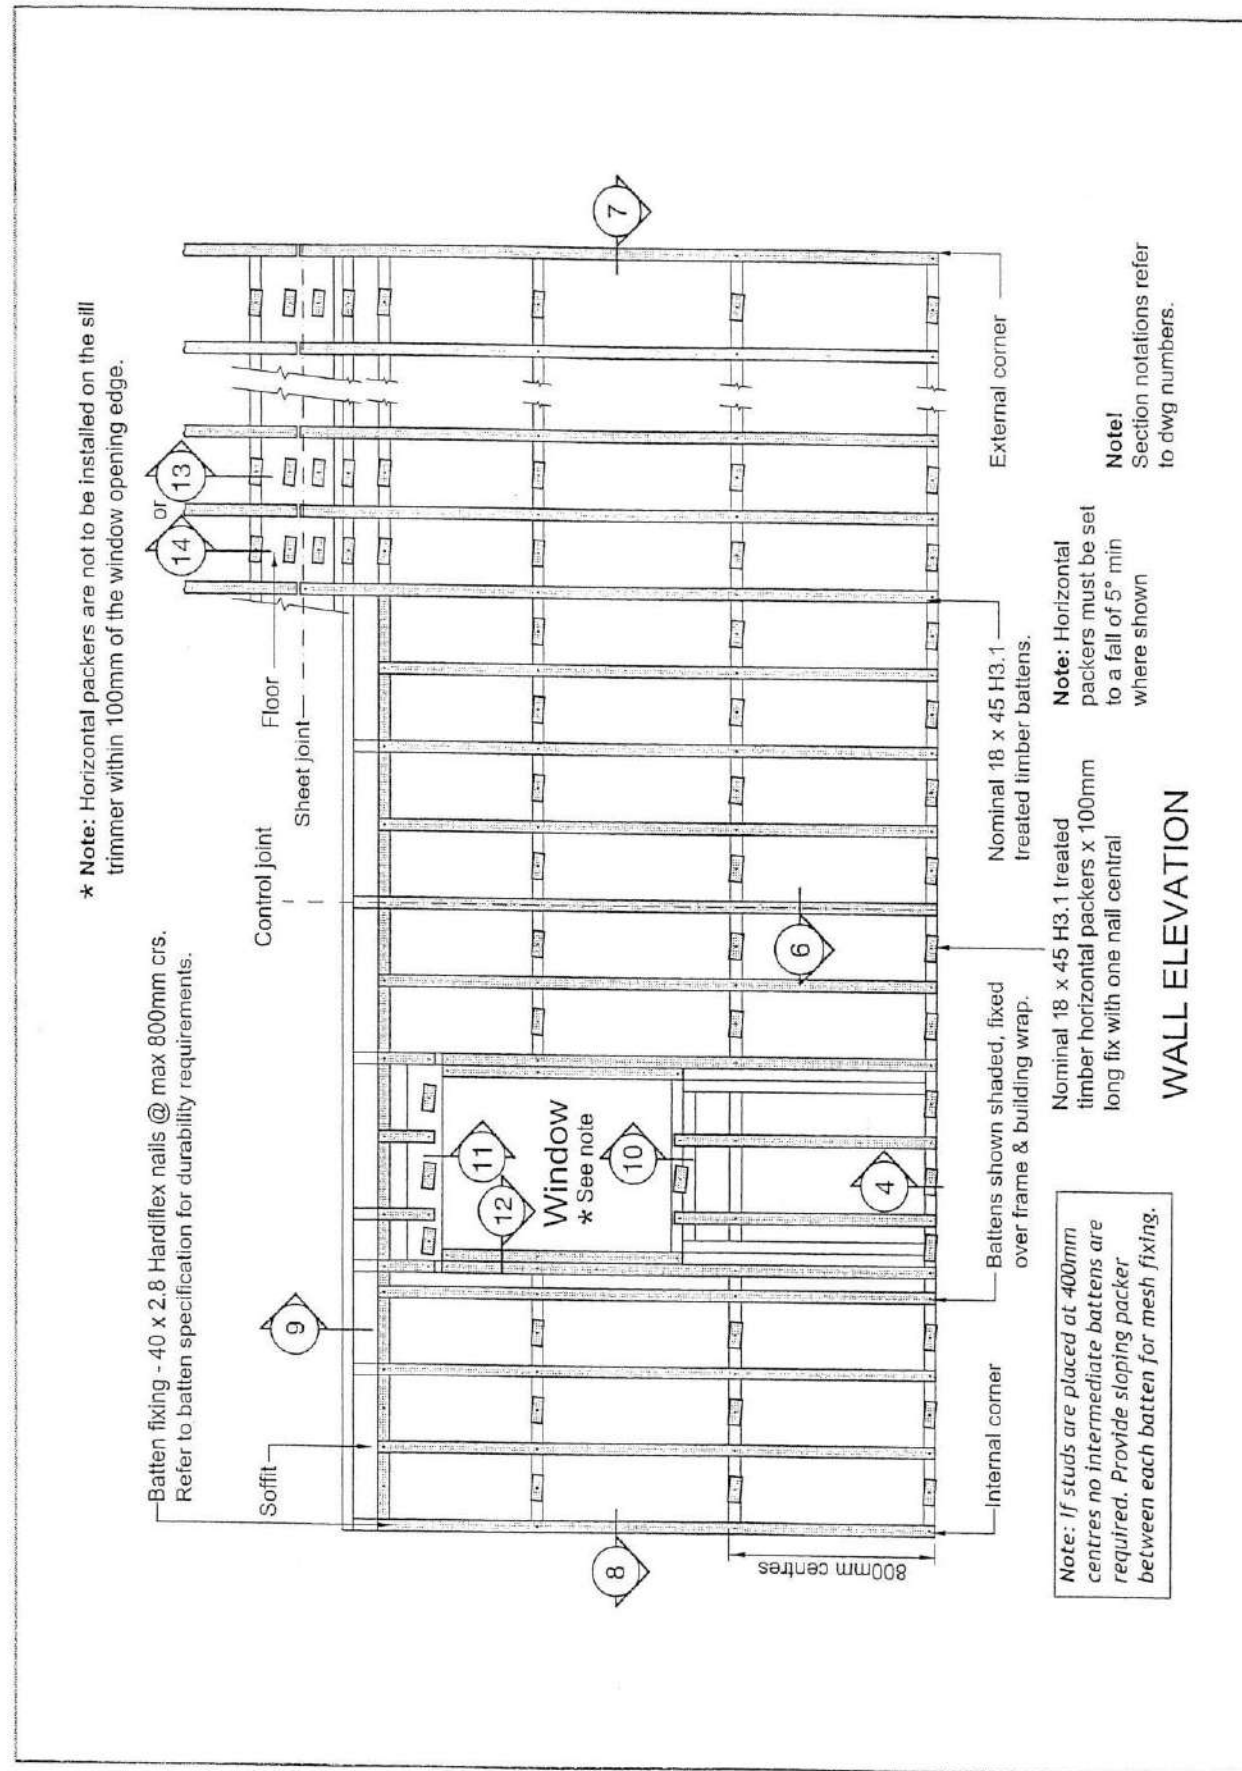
CAVITY TYPICAL FRAMING AND BATTEN SETOUT
